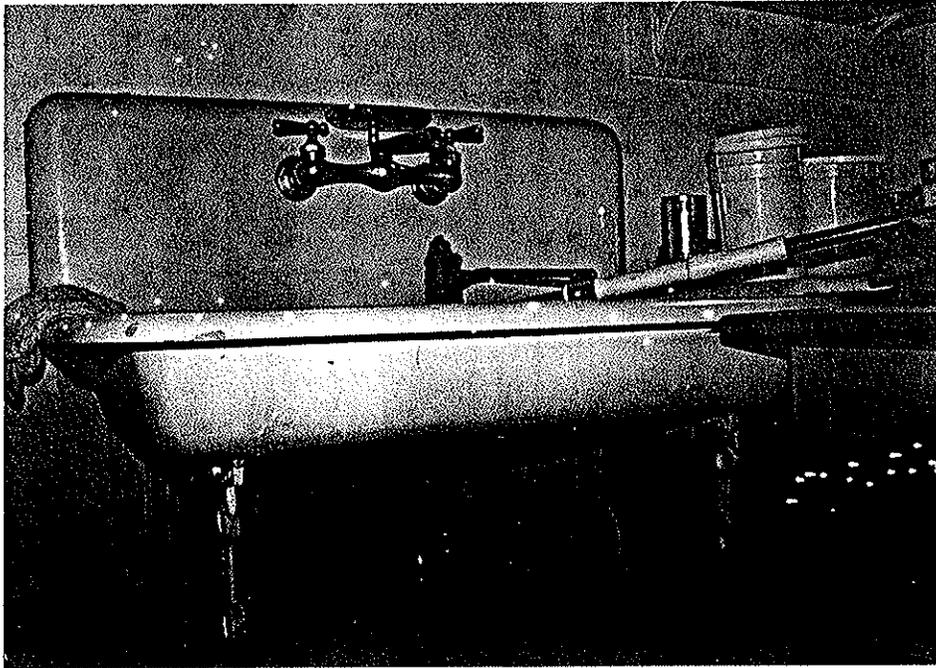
Weir House - Butler's Pantry [Room 105], West Wall, Circa-1900 Sink (1994).
